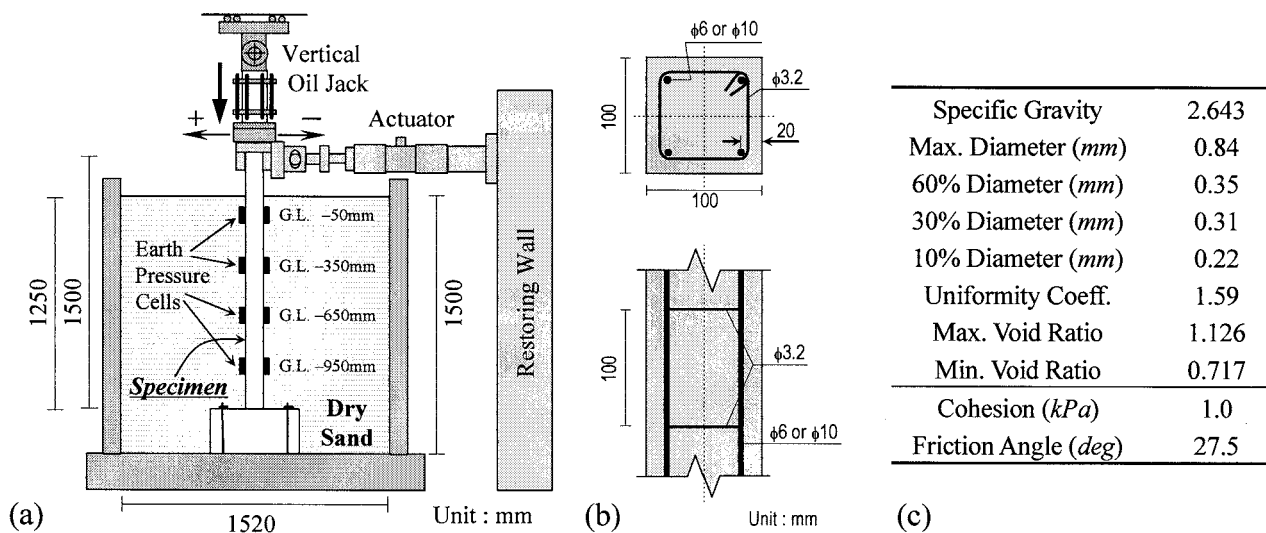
(a) Loading Setup, (b) Cross Sectional Detail of Specimen, and (c) Properties of Sand
